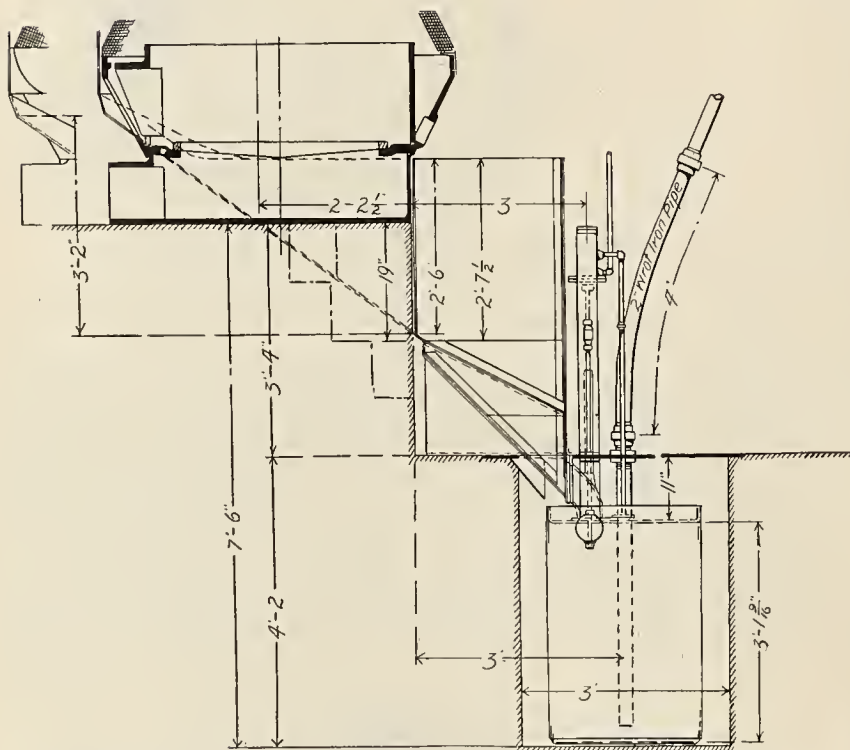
L. S. & M. S.—SAND HOPPER AND ELEVATING DRUM.
